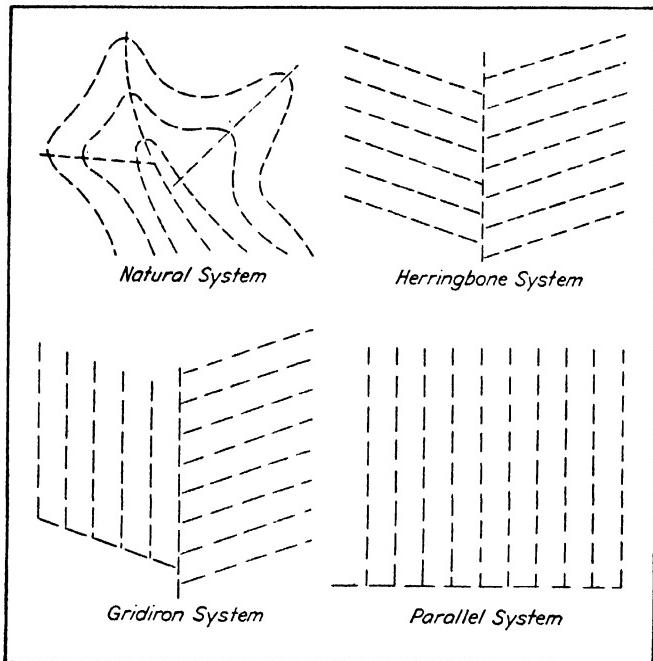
Types of layouts for subsurface drainage systems as used in all-over fields.
